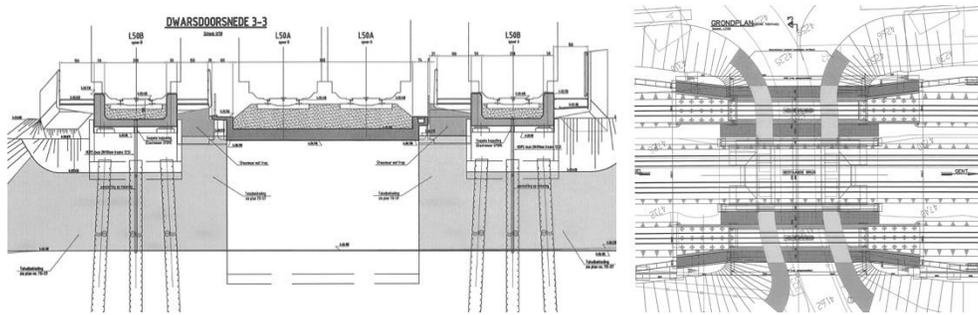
Concrete culvert bridges, cross-section (left) and plan view (right).
